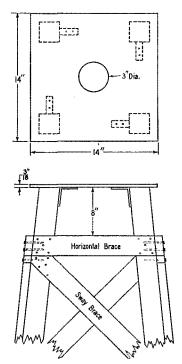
Detail drawings of the top of the W6APQ beam tower.
